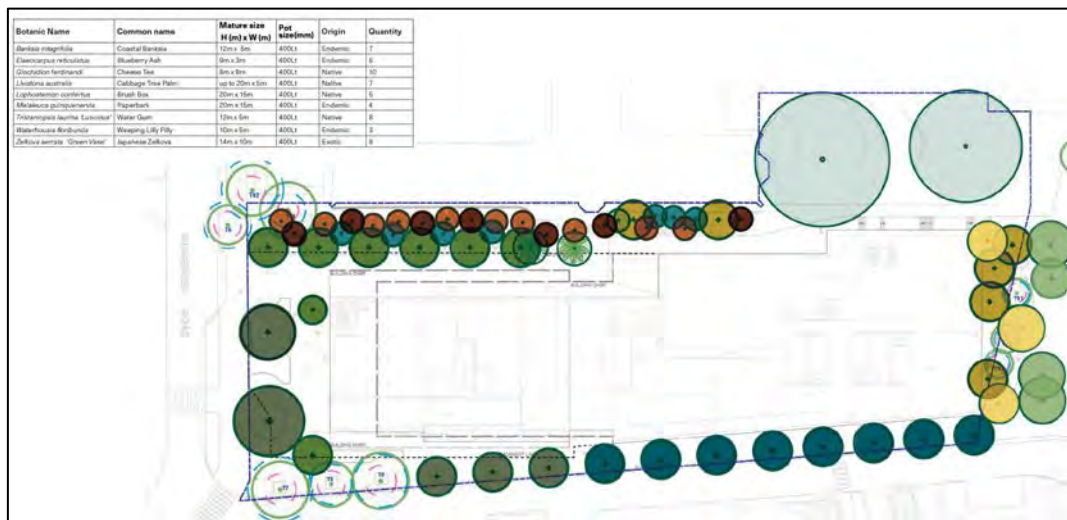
The proposed tree planting plan. (Source: Tree planting plan from Landscape Design Report by Aspect Studios dated 05/08/2025).
